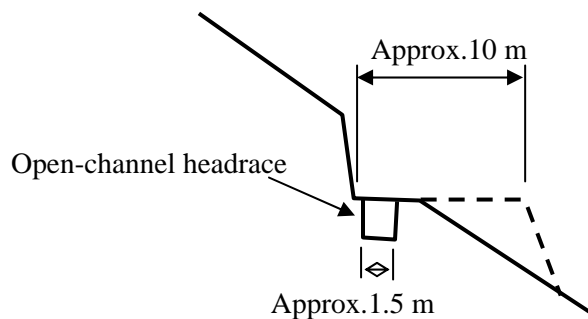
Cross Section of Headrace for Sokuluk-1
